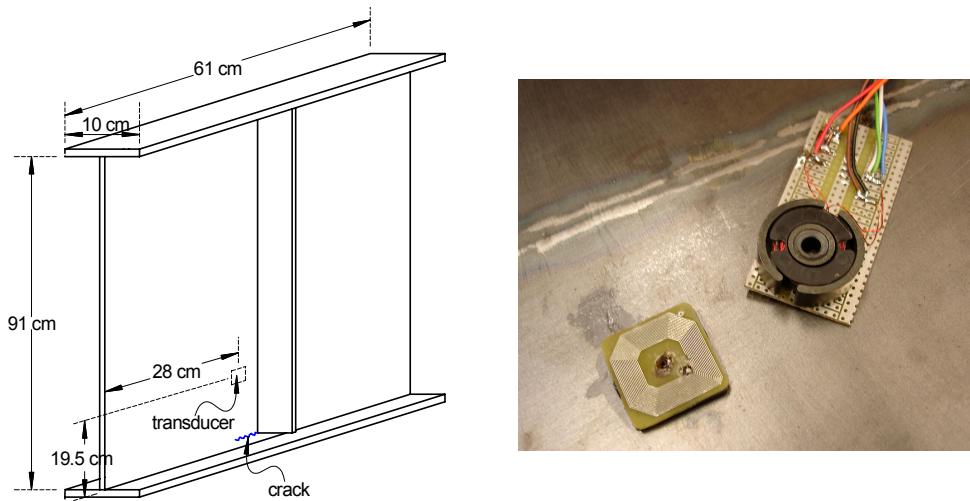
(Left) scale model steel plate girder showing transducer location and potential crack location; and (right) photo of planar coil transducer mounted on model plate girder and probe coil.
